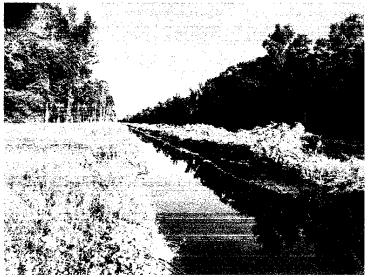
A typical channel after excavation and cypress tree removal. A low friction conduit.
